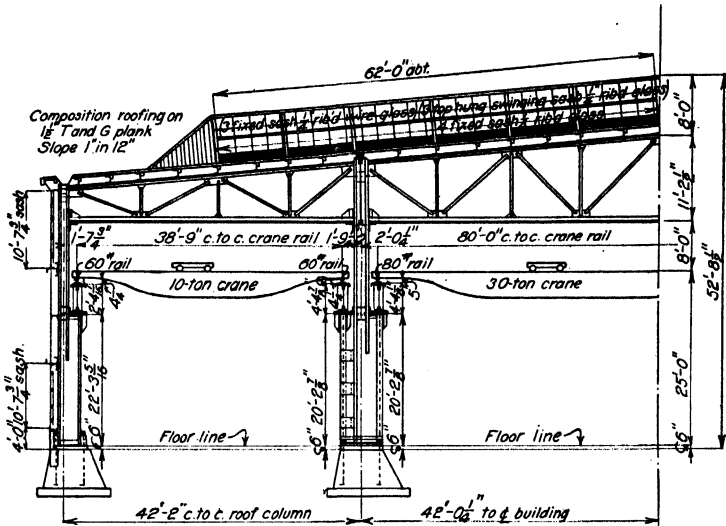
Machine shop. Cross-section showing capacity and elevation of cranes.
